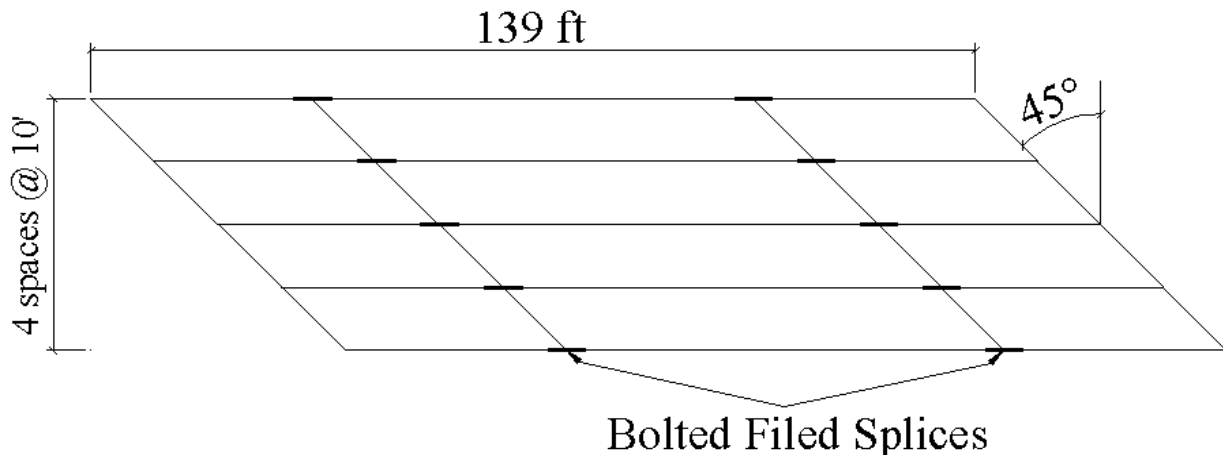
Superstructure Framing Layout (MUS-16-0261)
